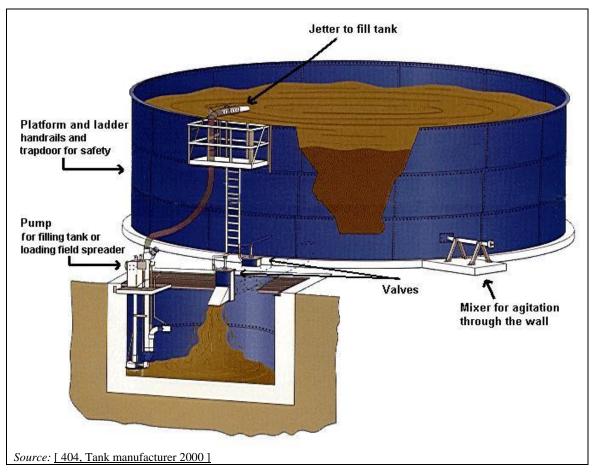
Example of above-ground slurry tank with an underground receiving pit
